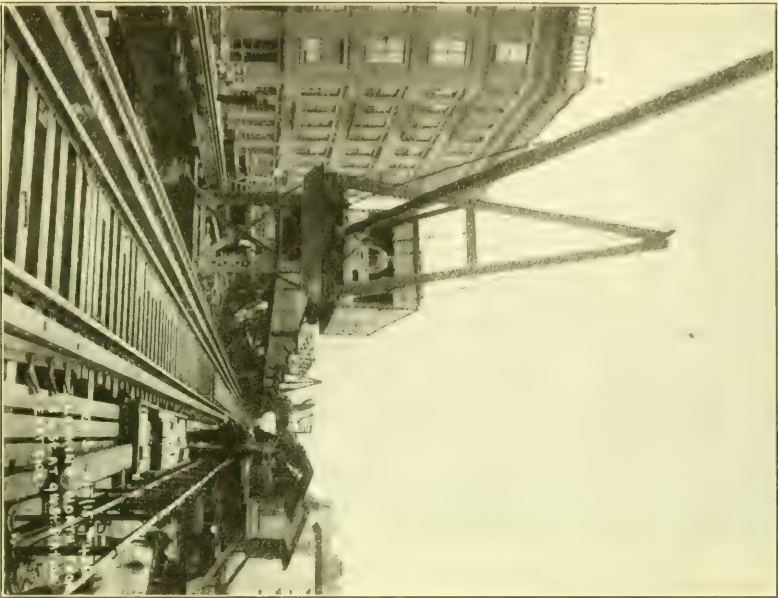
CROSSING ON NINTH AVENUE AT 53D STREET.
